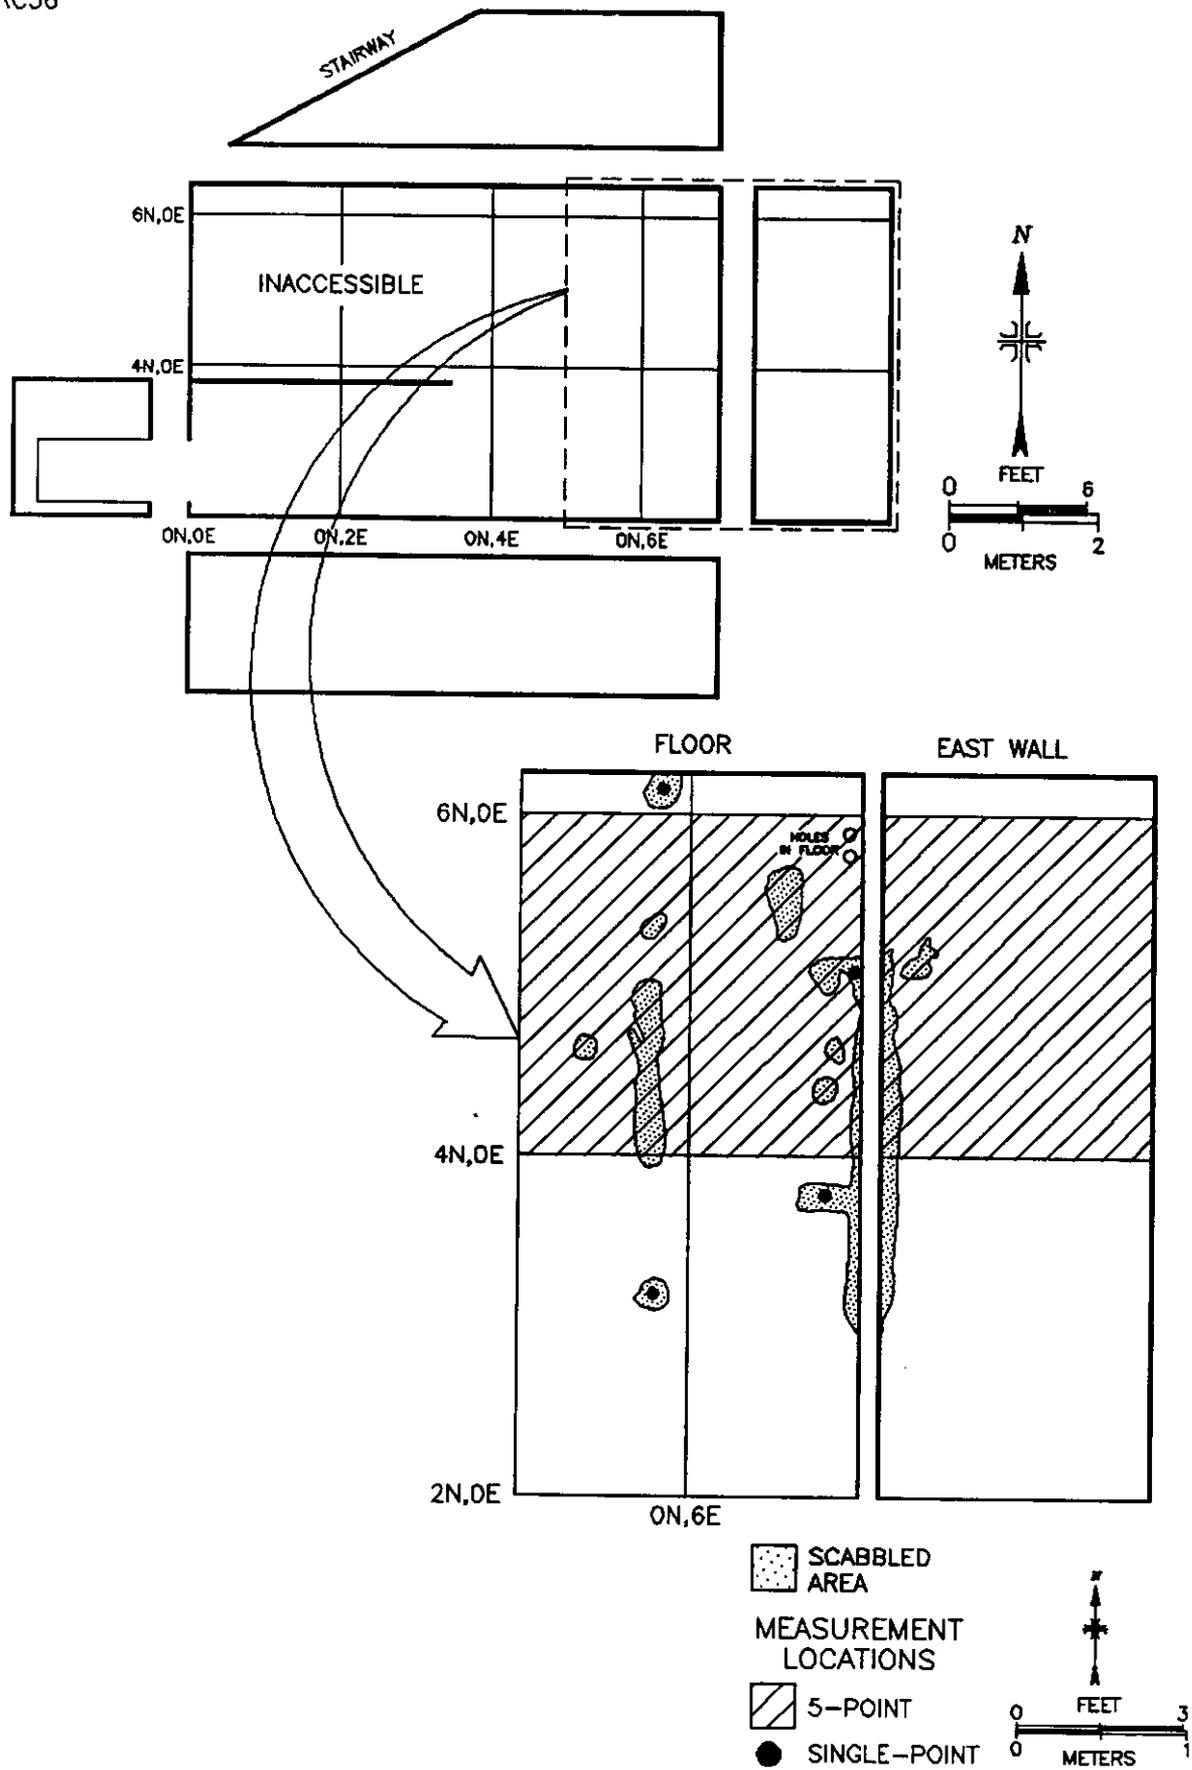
Building 1, Room 119, Indicating Measurement Locations on the Floor and East Wall
